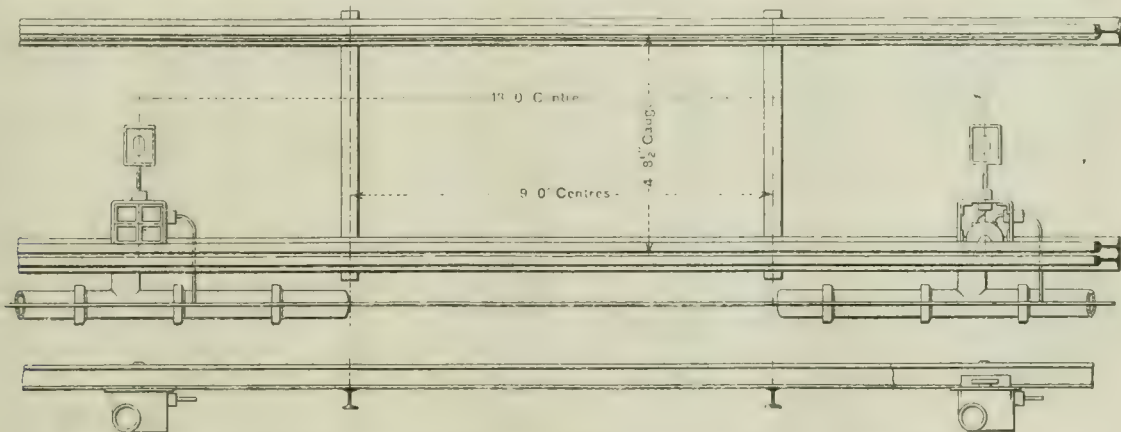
PLAN AND SIDE ELEVATION OF TRACK, SHOWING WORKING CABLE.
